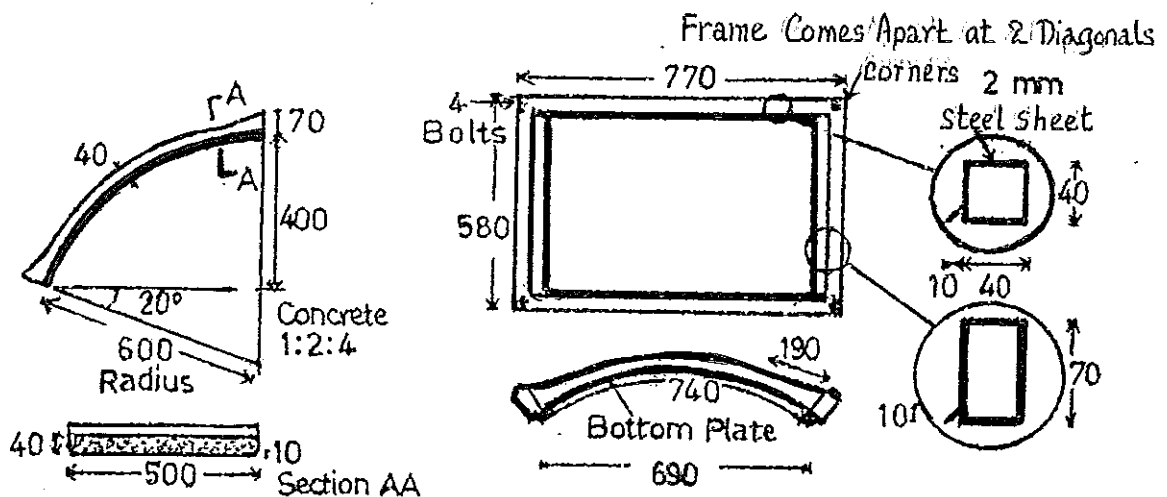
Precast Concrete Arch Sections for Tunnel
